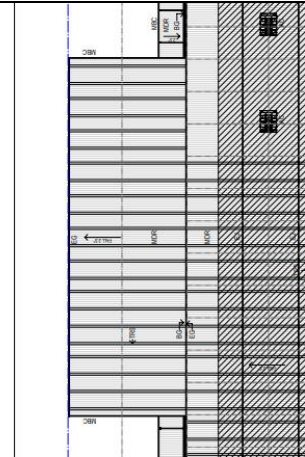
Excerpt from Roof Plan indicating awning built to boundary
